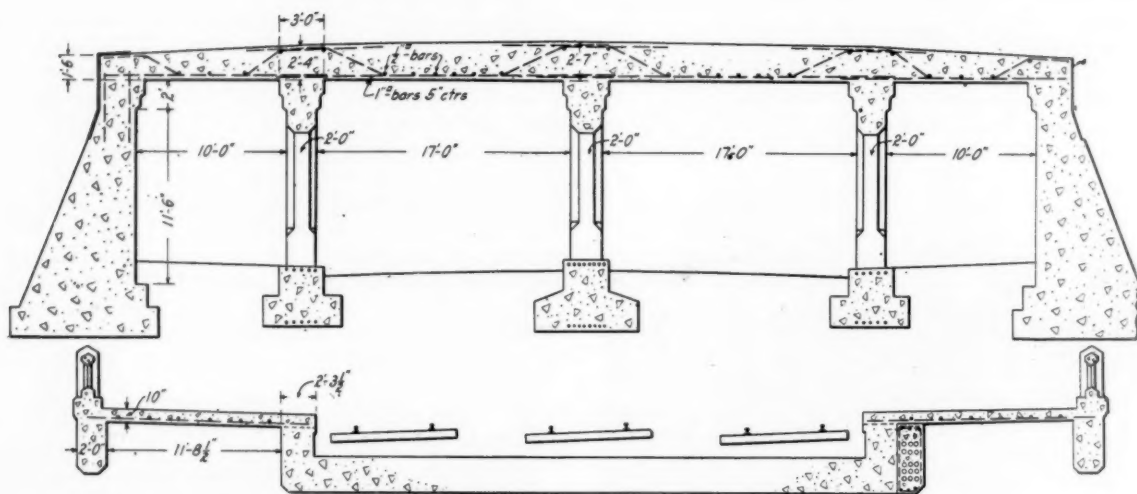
Typical Details of a Reinforced Concrete Slab Subway Continuous Over Three Supports
